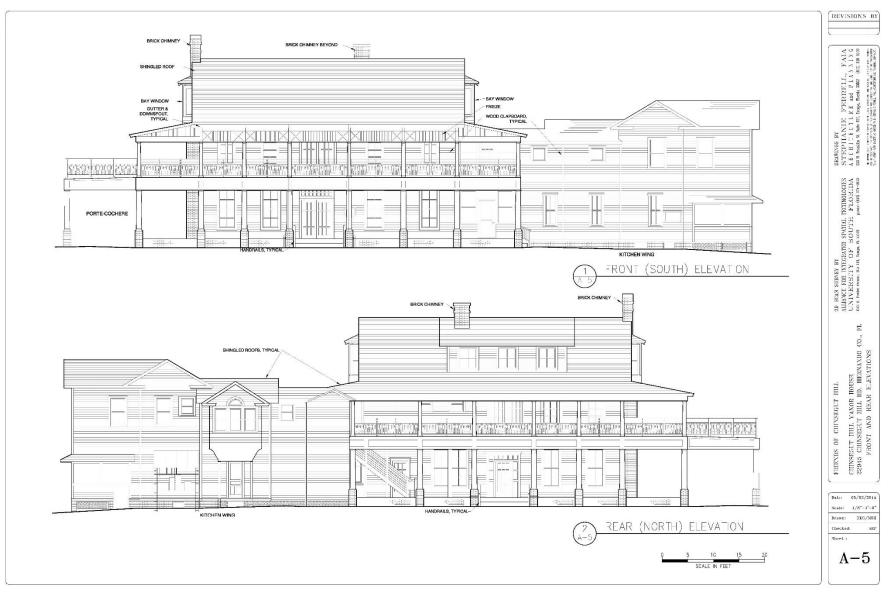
North or Rear Elevation of the Chinsegut Hill Manor House.
